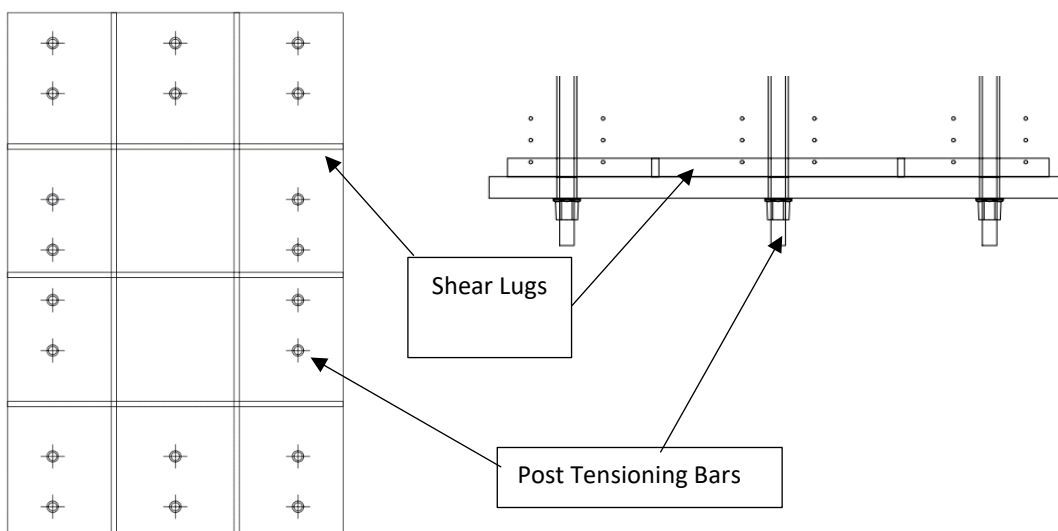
Example of shear lugs welded to the base plate (left: front view; right: side view).
